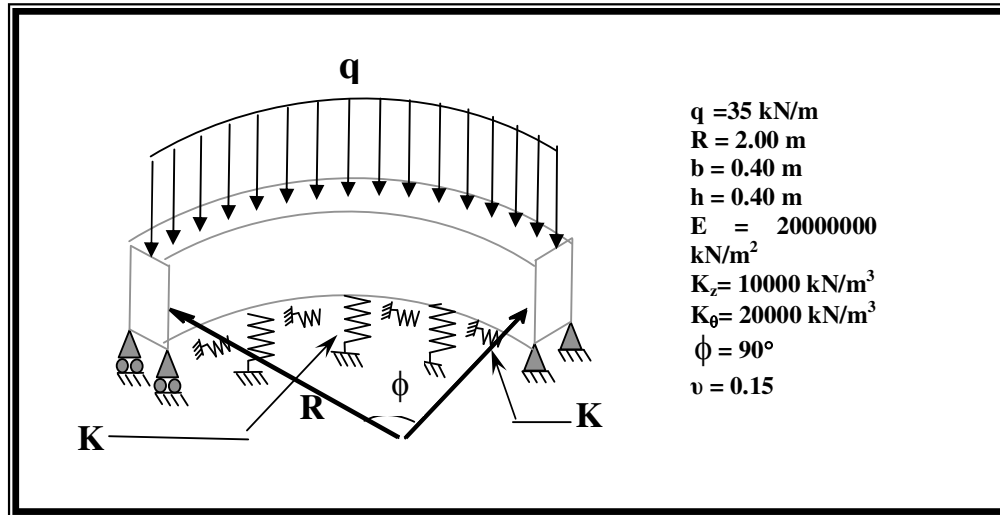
Simply supported curved beam resting on a Winkler foundation under a uniform load.
